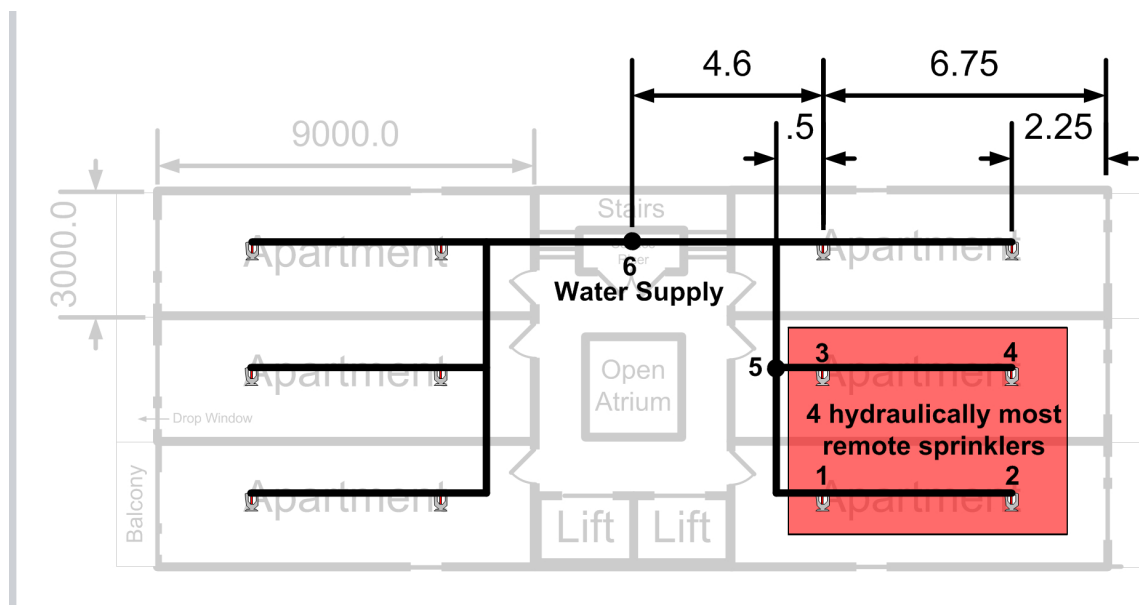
Sprinkler layout for one floor of the SME building. Nodes used for the hydraulic model are shown. All piping 32 mm diameter, dimensions shown in m.
